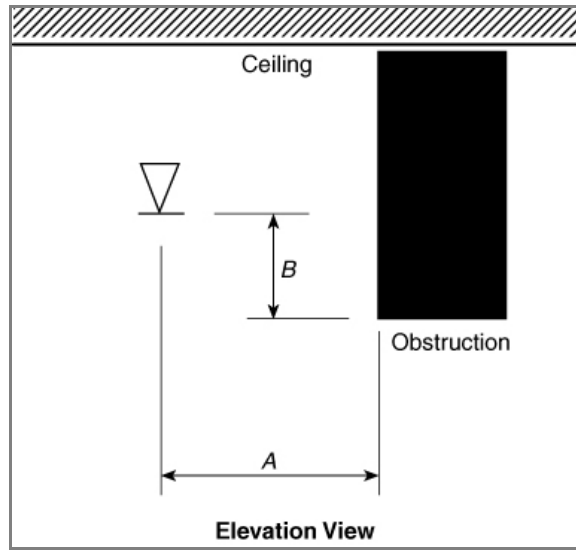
(b) Obstruction Against Wall (SSU/SSP).
